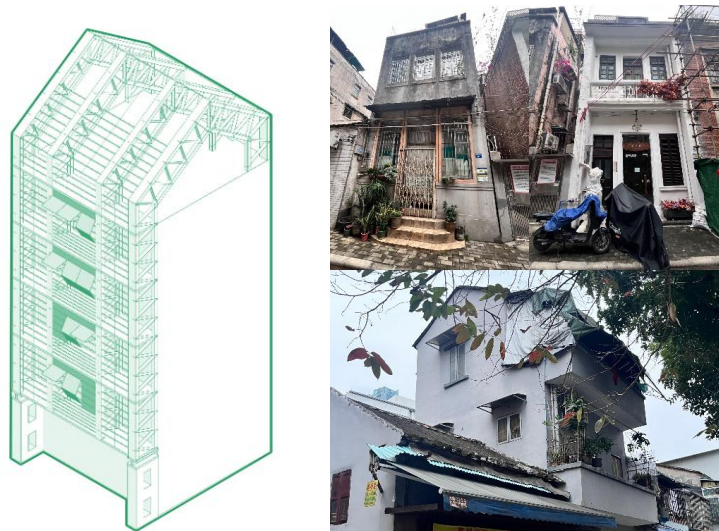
New "STREET-FACING SECURITY GRILLES" pattern (Source: author)
